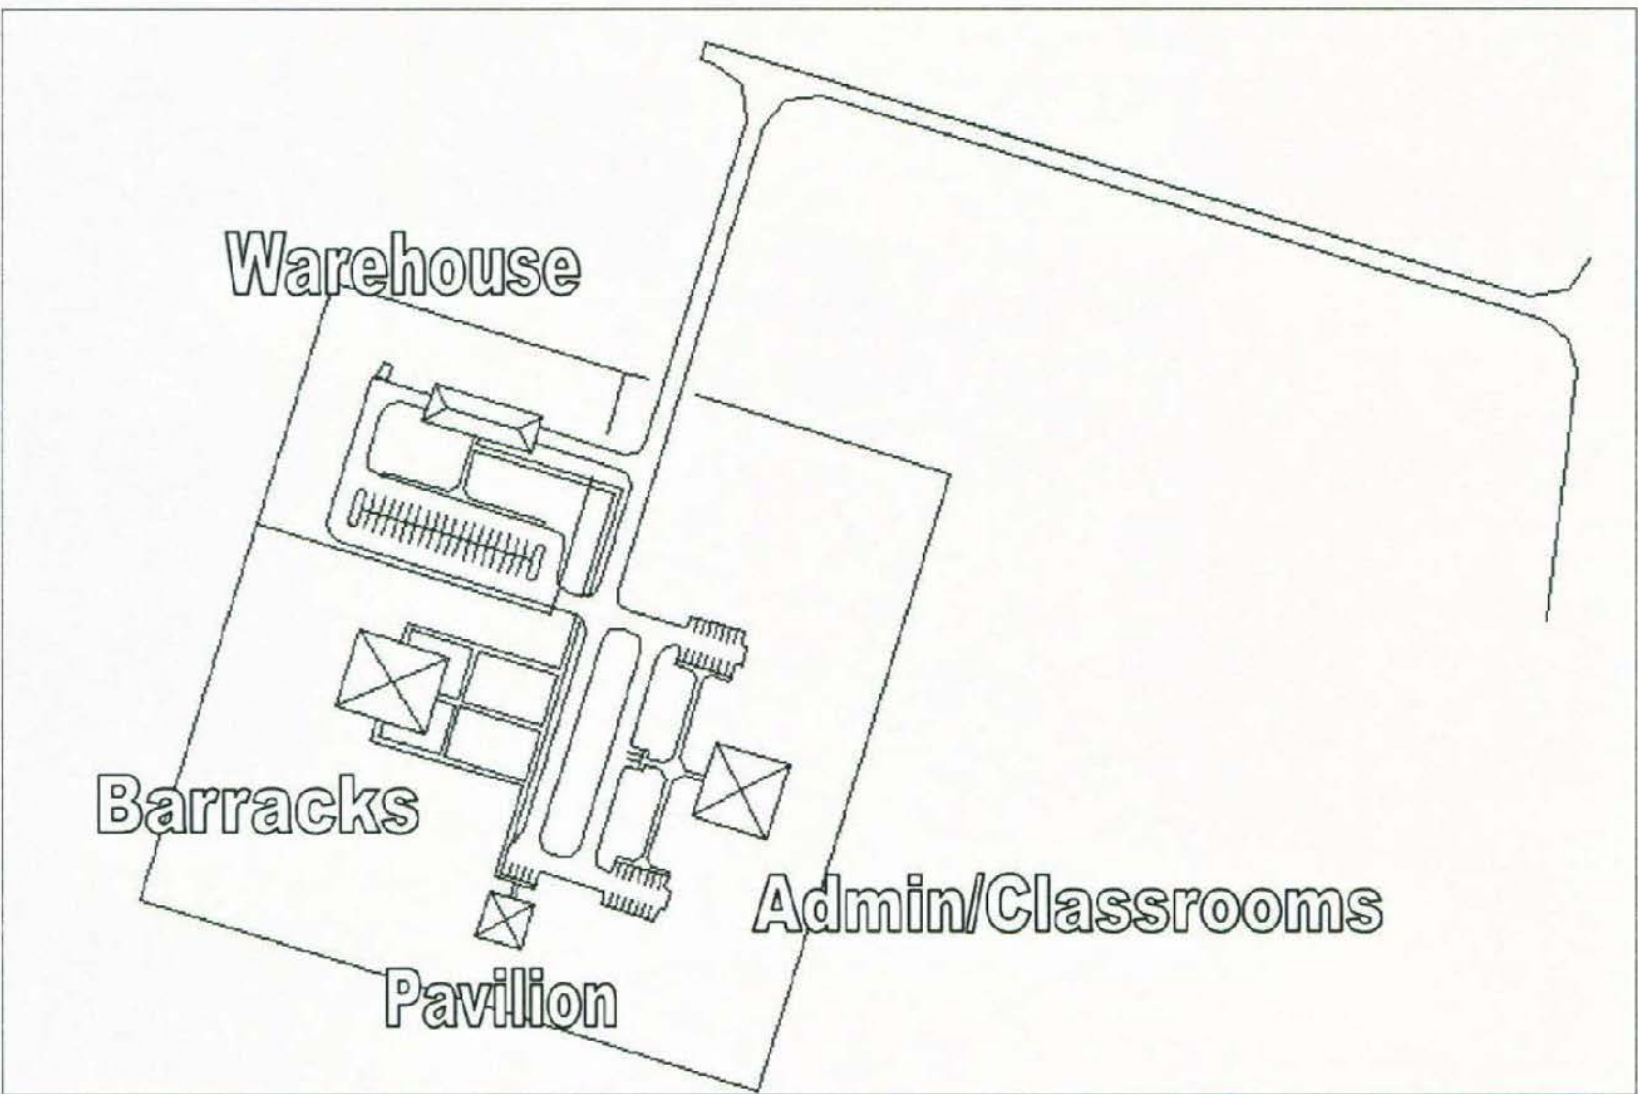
General Site Plan for Proposed Facilities within "Base Tango" Area
